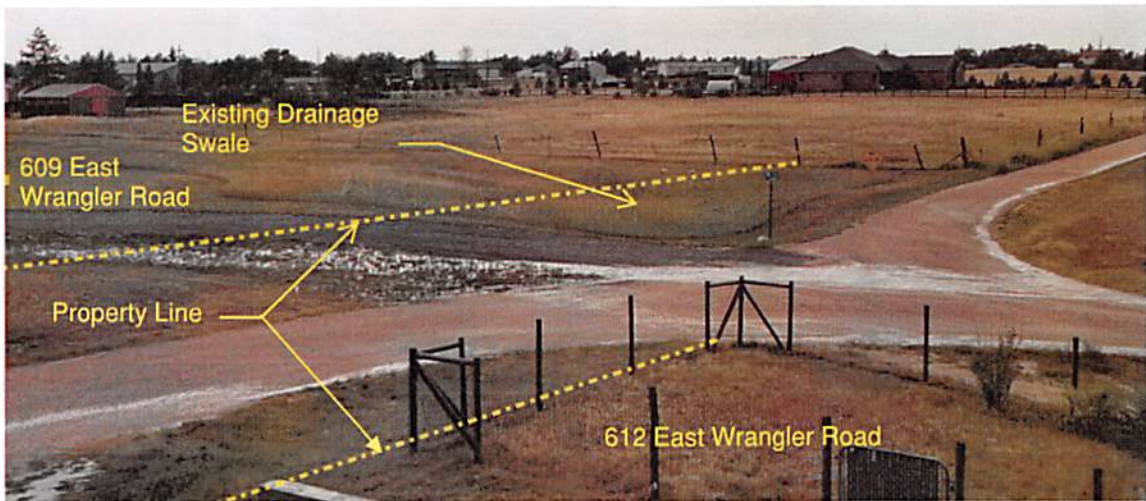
Drainage from 609 East Wrangler Road is not able to cross the new driveway to reach the existing drainage swale.
